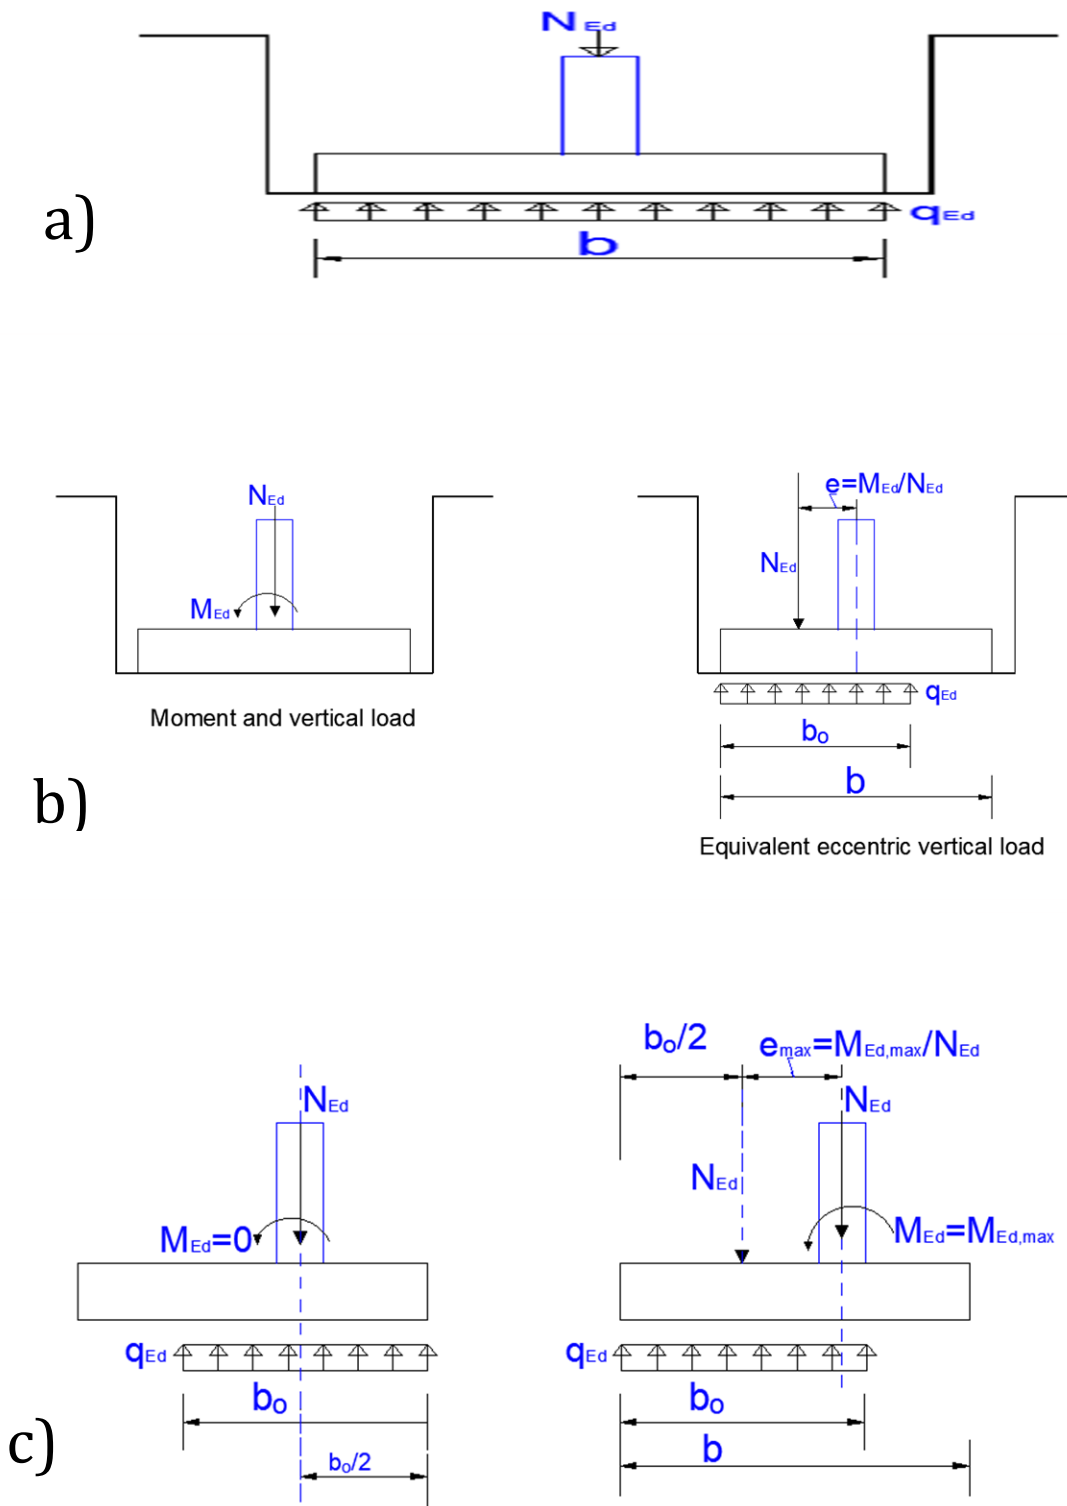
a) Wall foundation is subjected to central load b) symmetrical wall foundation subjected to eccentric vertical load c) asymmetrical wall foundation subjected to eccentric vertical load[15]
